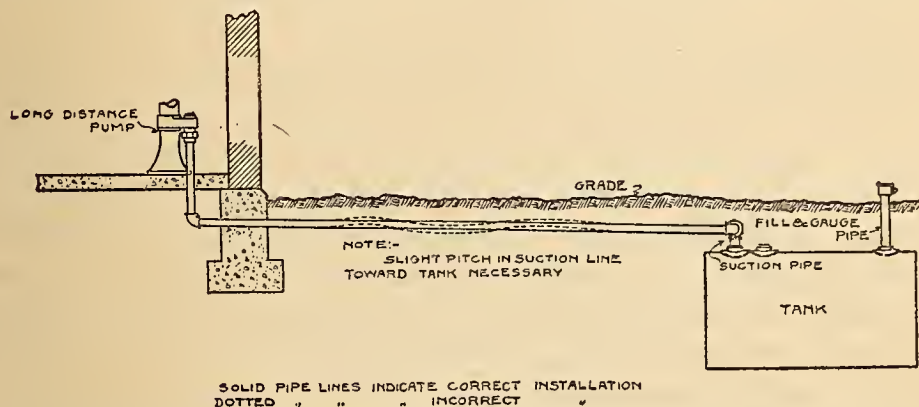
Illustrating correct and incorrect practice in installation of piping. Suction pipe should have a continuous, though not necessarily uniform, pitch from pump back to tank
